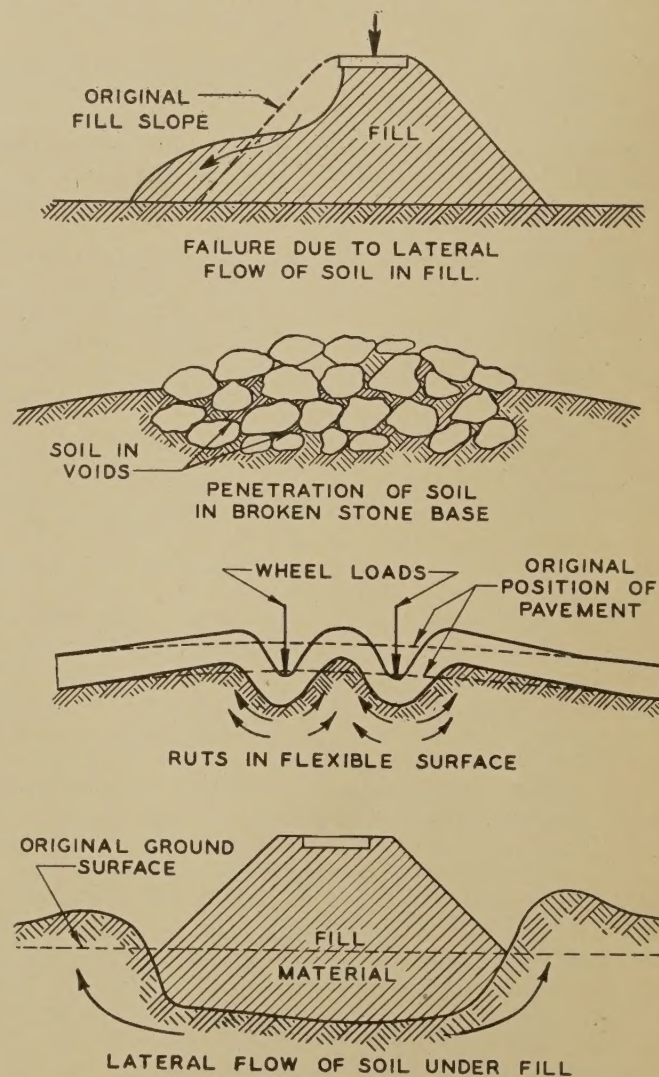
TYPES OF ROAD FAILURE CAUSED BY LATERAL FLOW OF THE SUBGRADE SOIL
